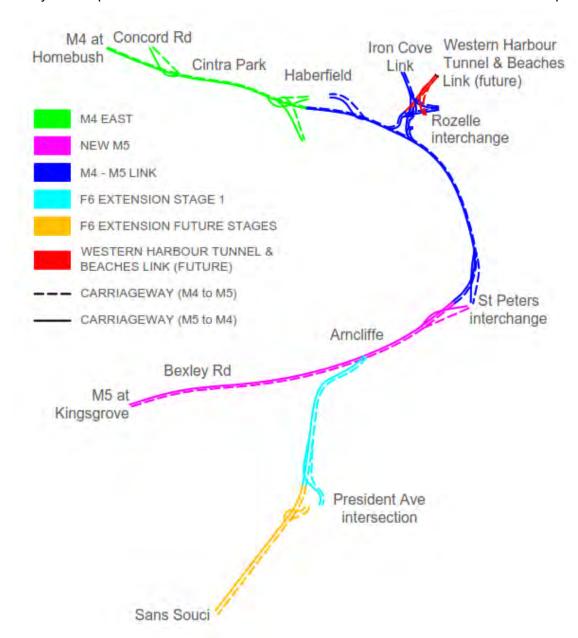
Layout of F6 Extension and interconnected tunnel network.
